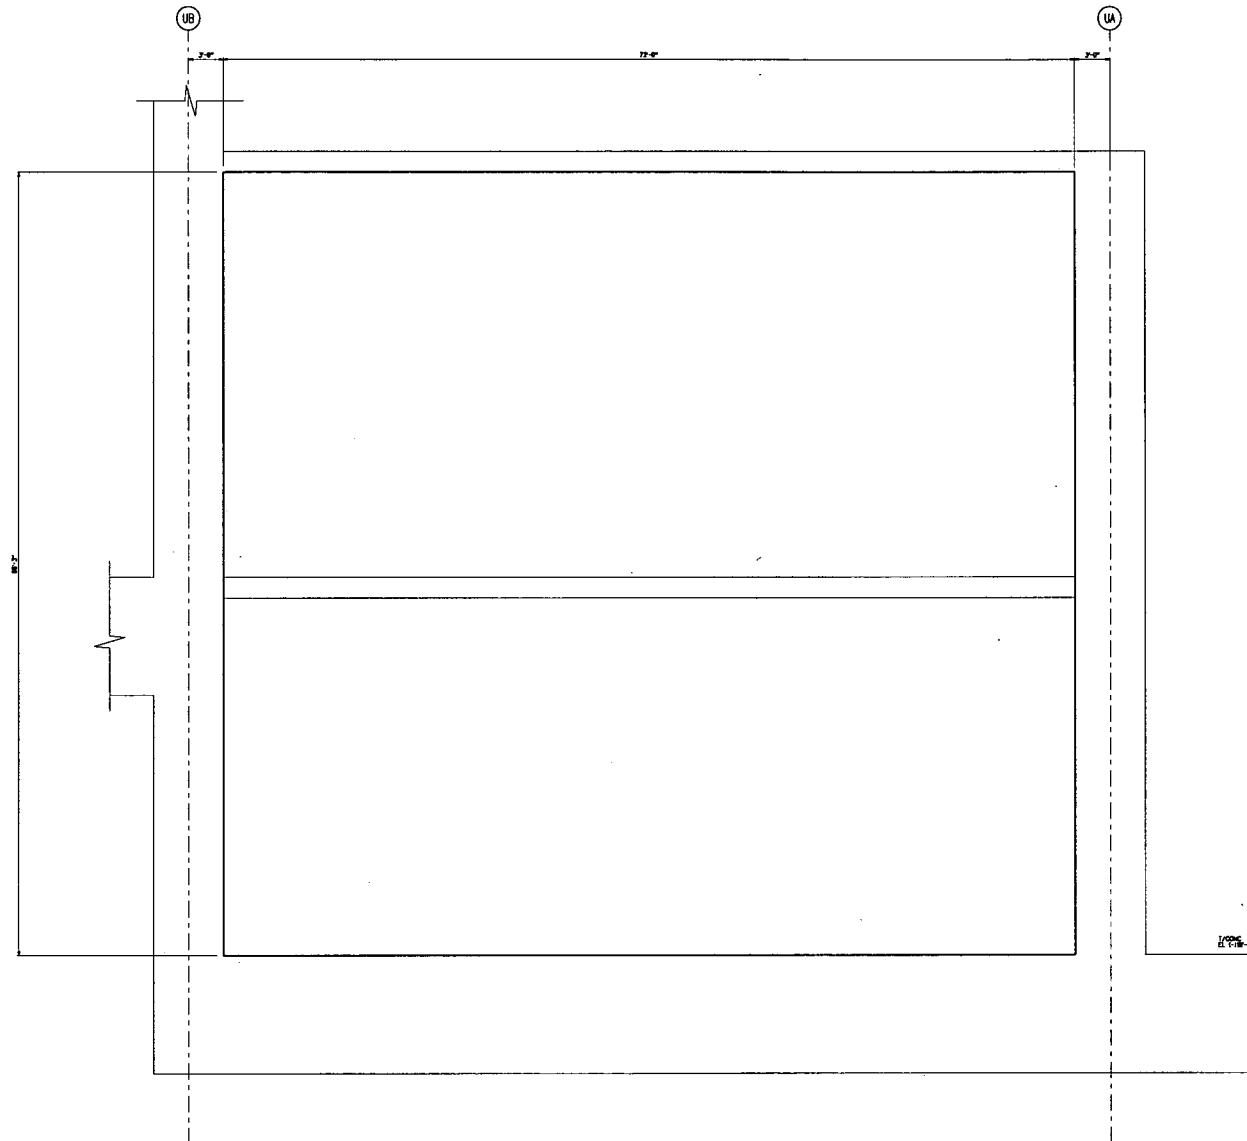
PUMPHOUSE WEST WALL LOOKING EAST
